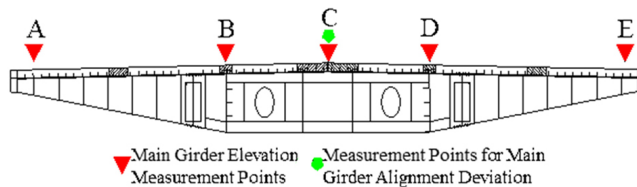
Layout plan for main girder elevation and alignment deviation measurement
